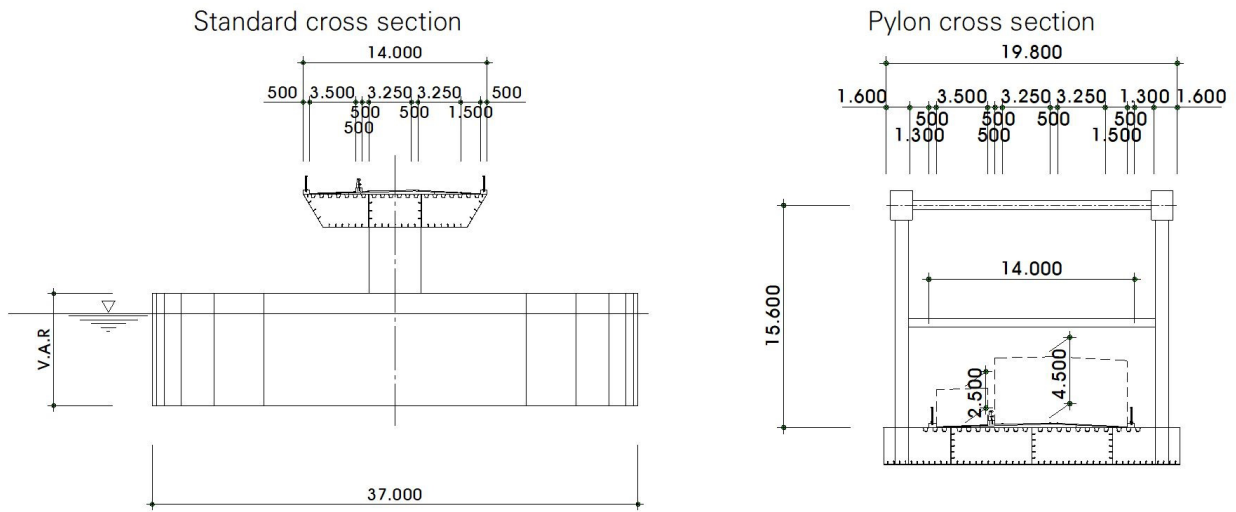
Standard cross section and pylon cross section of the floating steel box girder bridge
